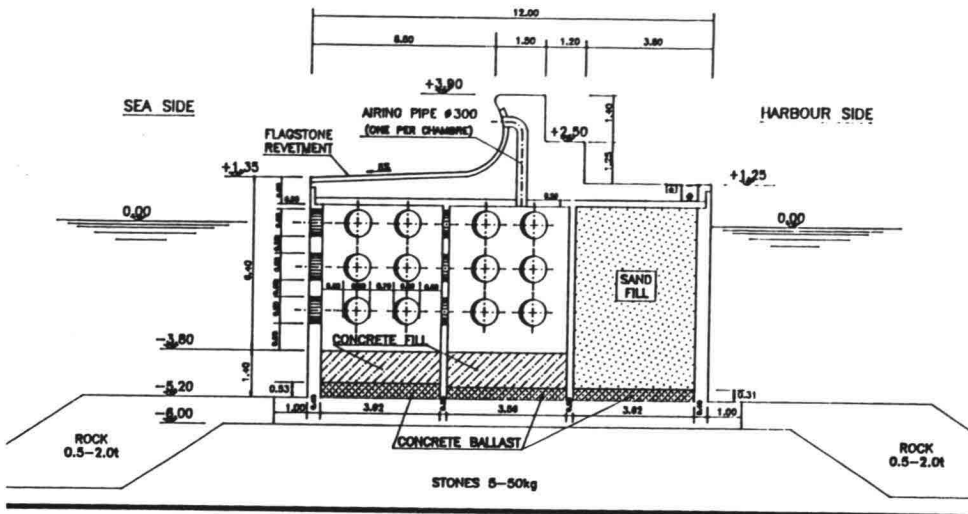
Design sections of the new caisson breakwater at Ponza (1992)
